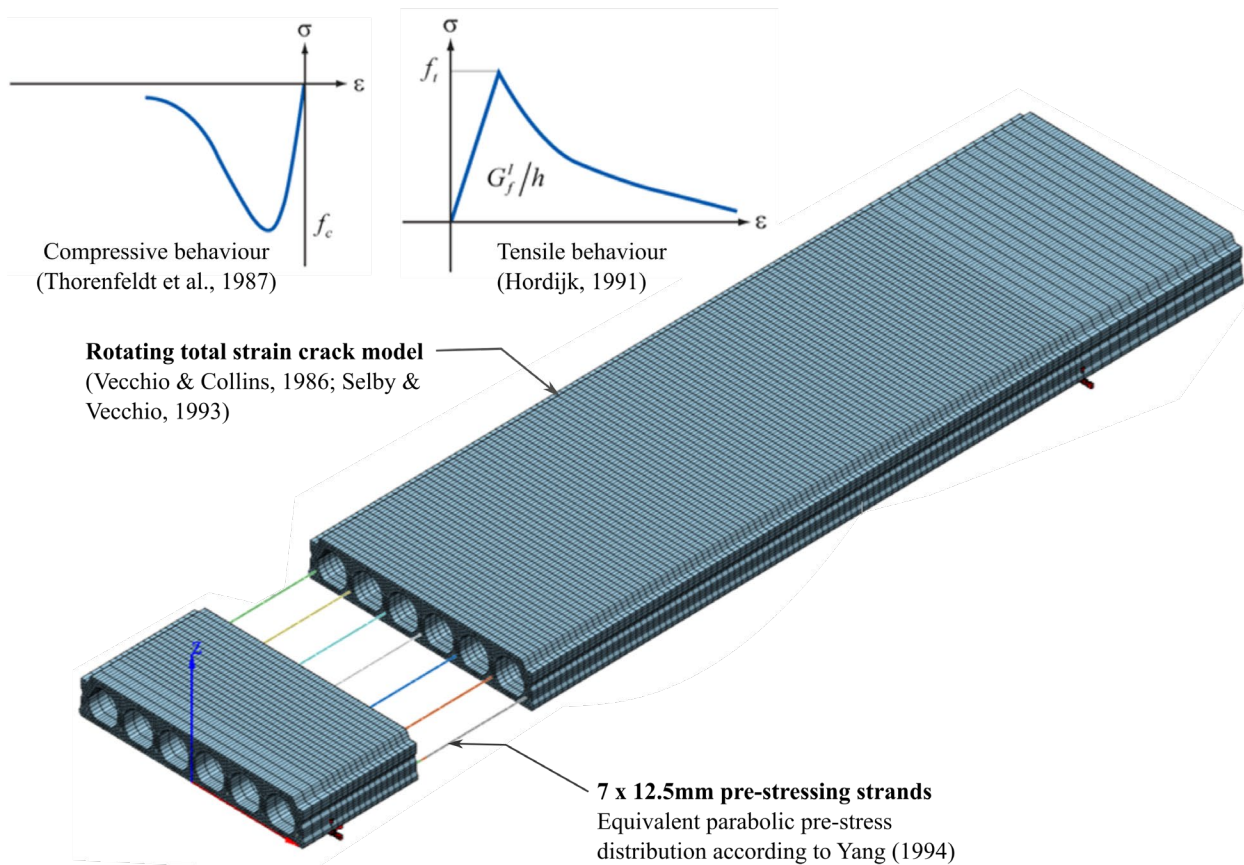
Example of detailed solid FE model developed for hollow-core units.
